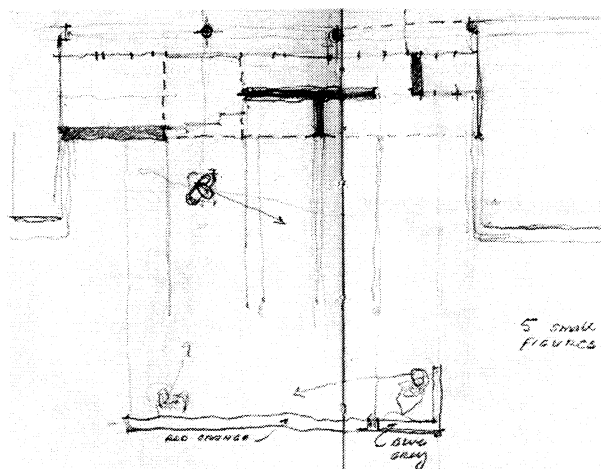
Plan and elevation sketches by author of gallery three in the Castelvecchio museum.
